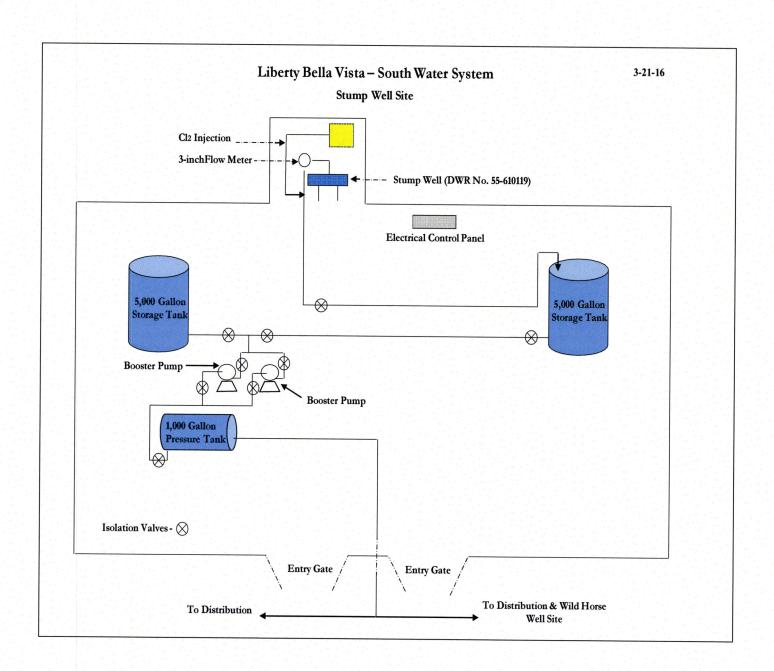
SOUTH WATER SYSTEM STUMP WELL SITE
